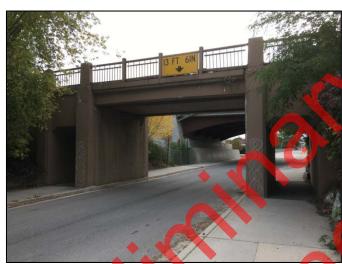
Bridge 3.0 – View of Bridge from West side looking East
